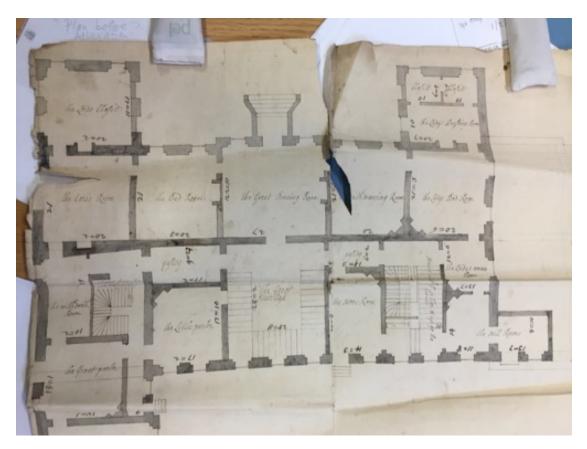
Plan of Cheveley House, northeast wing, c.1732. 522
